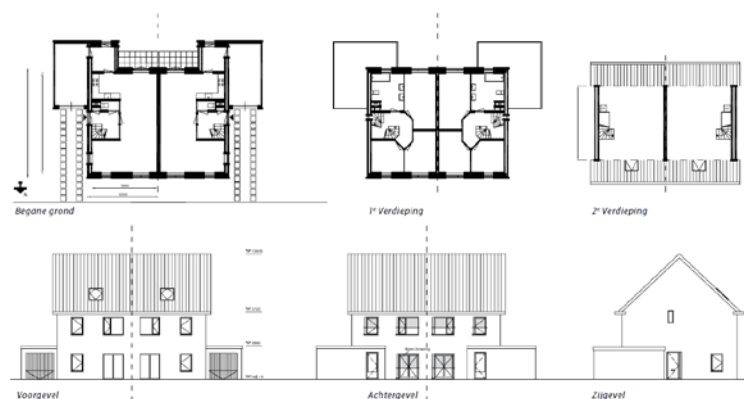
Floor and elevation plans of a semi-detached house [40]
